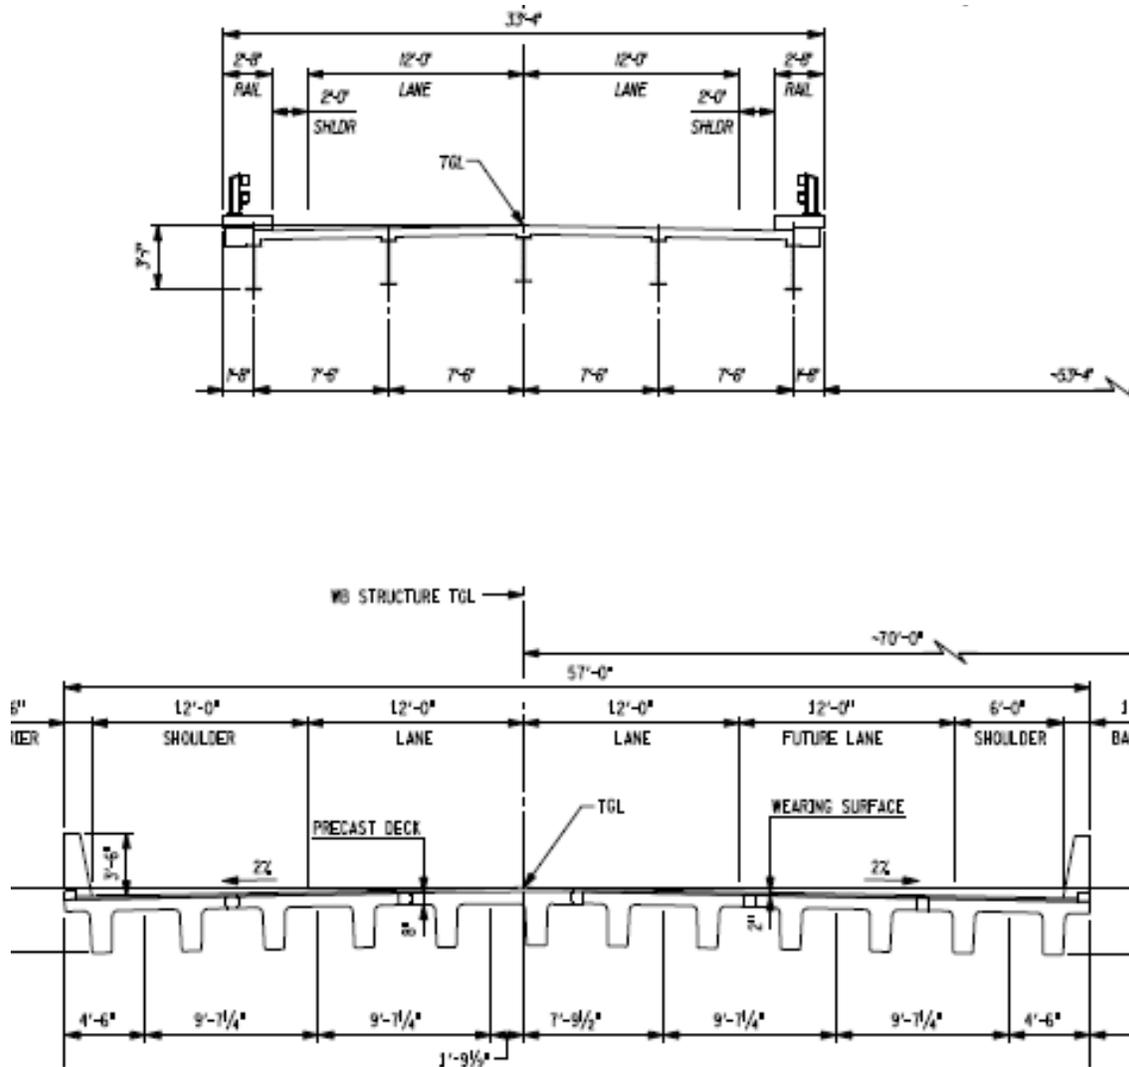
Diagram. Superstructure sections of replaced and new bridges.
